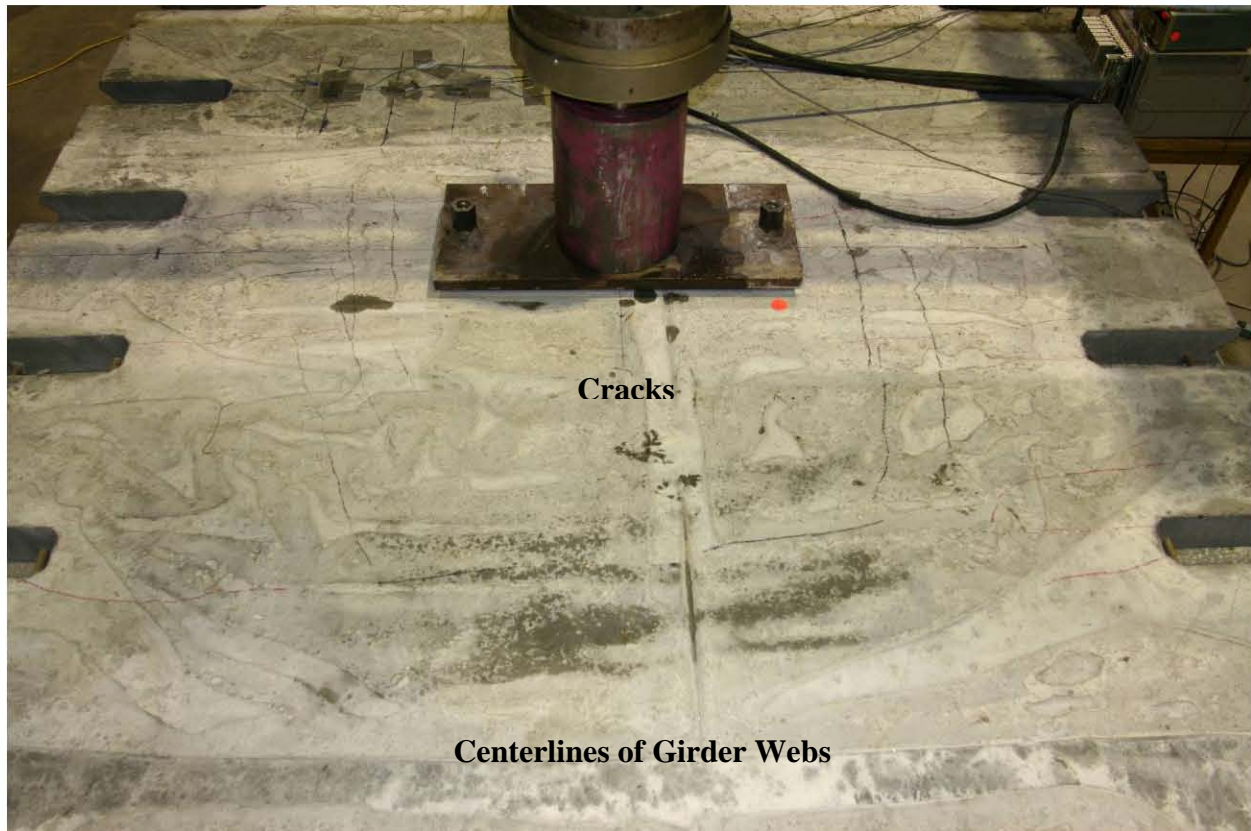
Photo. Topside deck cracking of T2D at 1067 kN (240 kips) of applied load.
